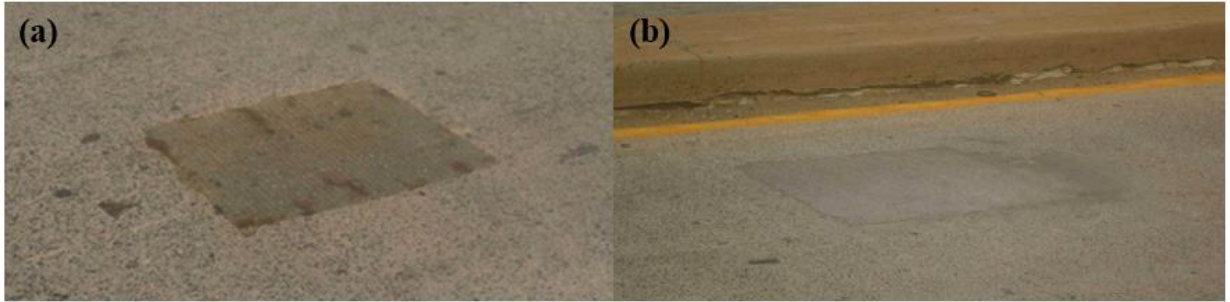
Example of (a) old bituminous patch on the concrete deck and (b) new concrete deck patch.
